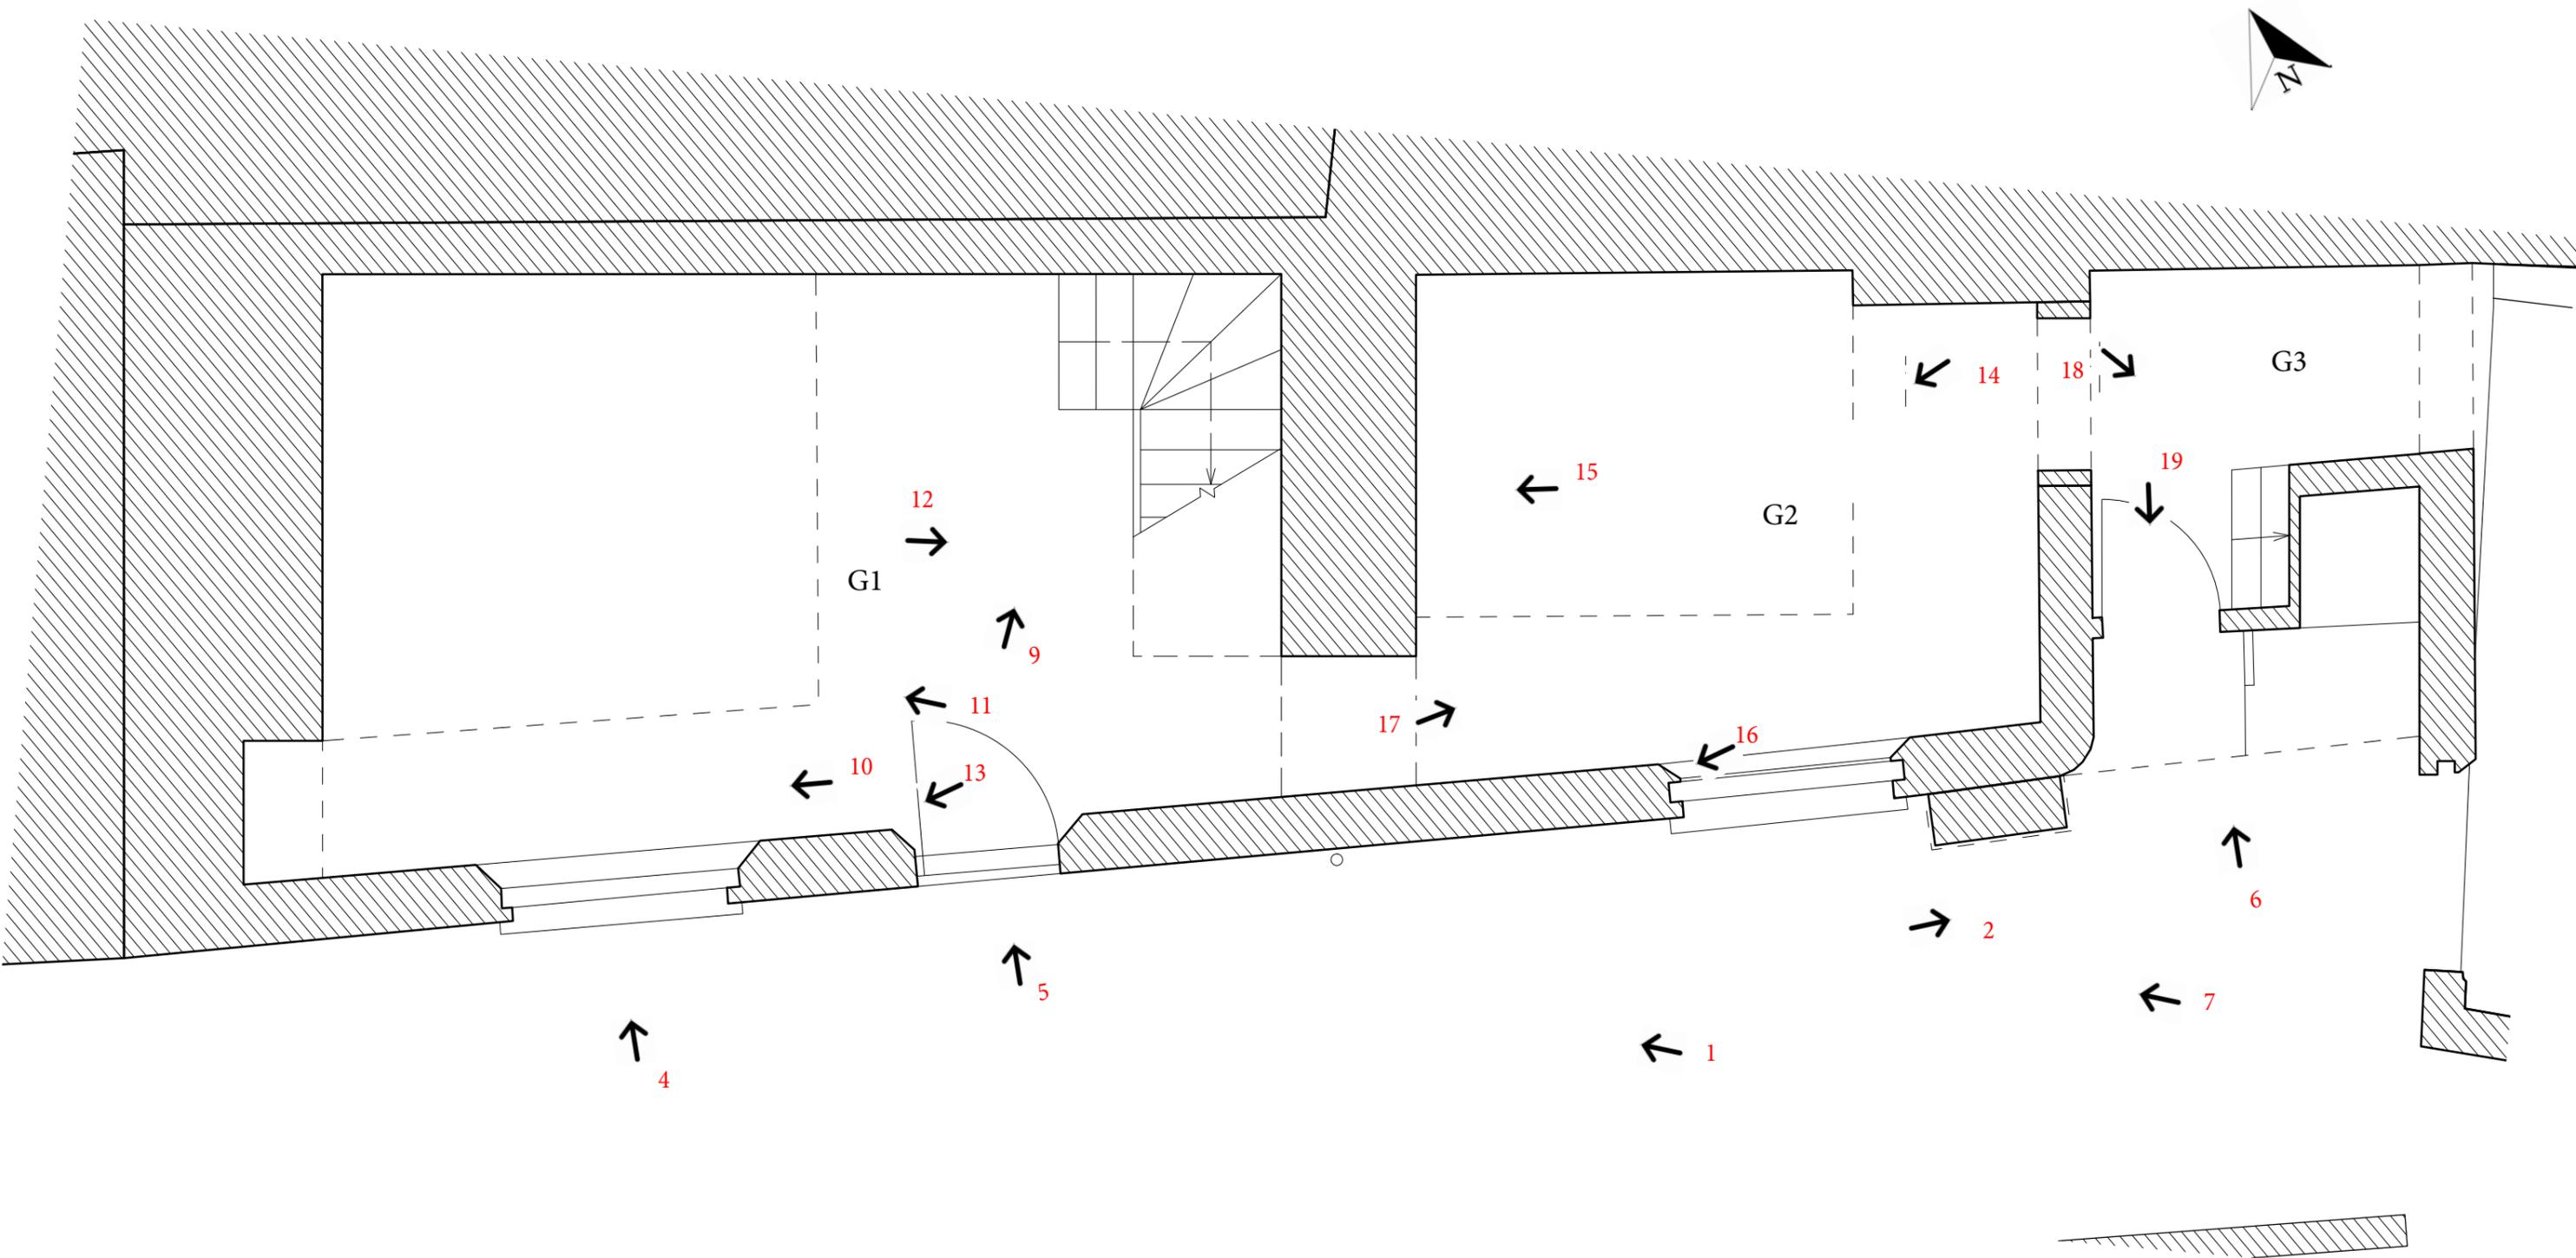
Ground Floor Plan showing room numbers and location of plates referenced in report (red)
